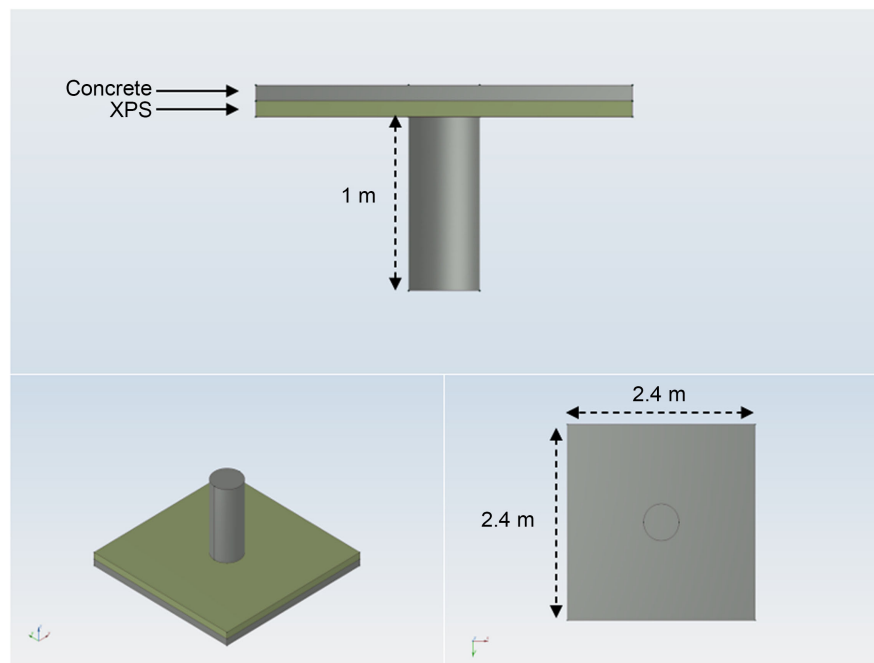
Geometry of circular concrete column and insulated concrete layer.
